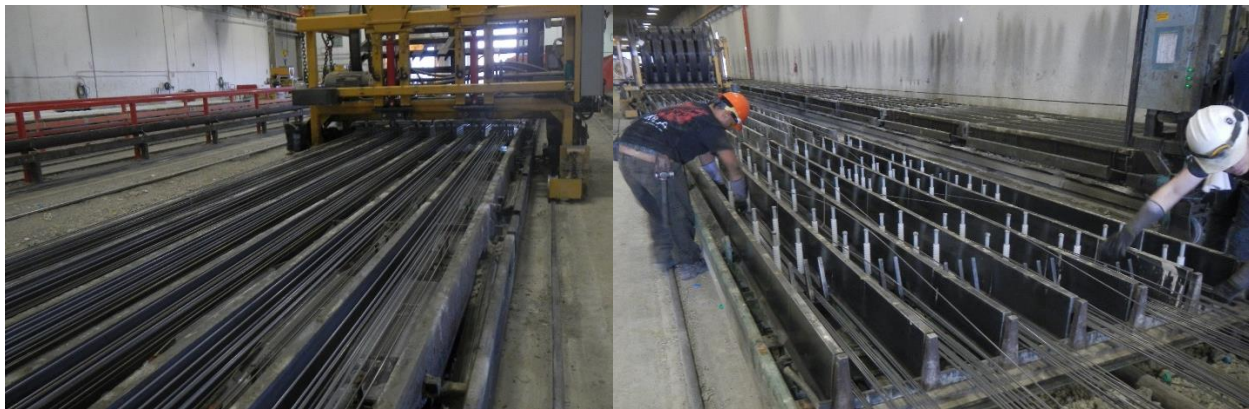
a) Reinforcing steel wires during installation, and b) enforcing the wire spacing pattern in Plant A
